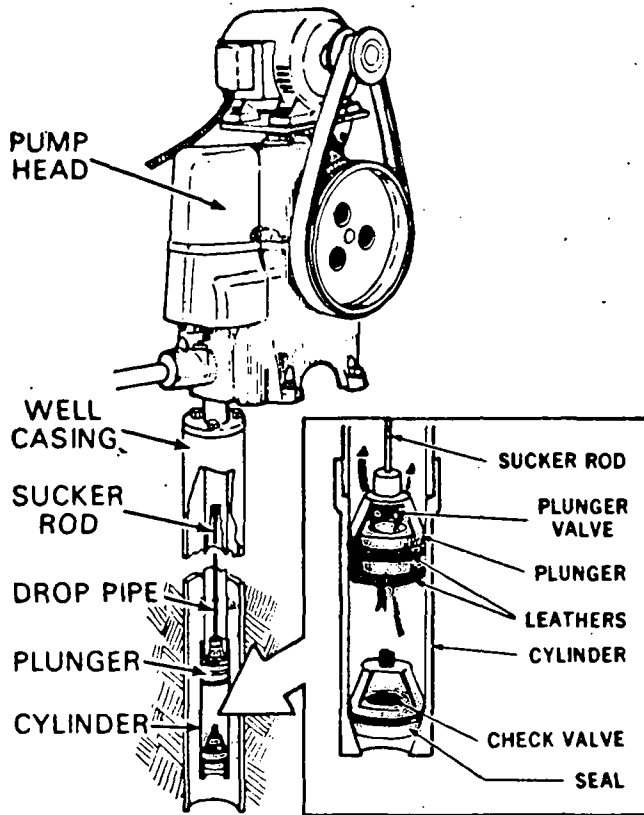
A deep-well piston pump is installed with the pumping mechanism in the well, usually below water level.
